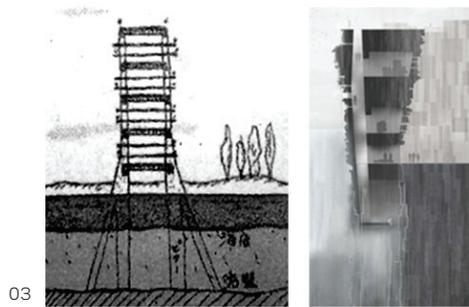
Left: section of Otaka's Harumi apartment buildings. Right: Rooting Tsukiji section
